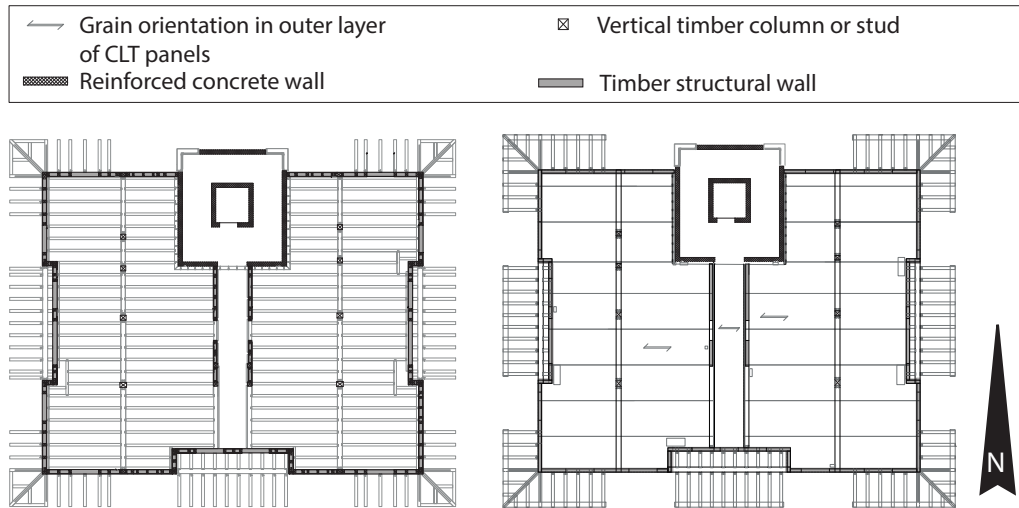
Plan sections of the TF (left) and CLT (right) tested buildings, showing structural elements
